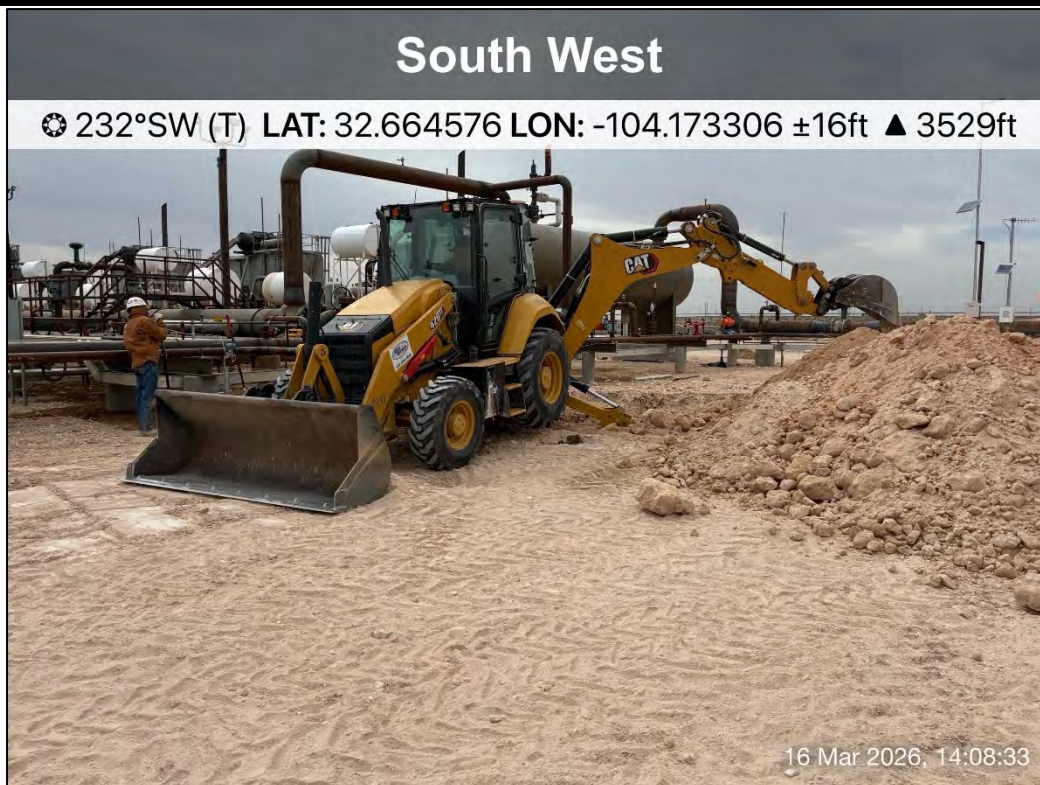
Southwestern view during excavation activities. 3/16/2026
